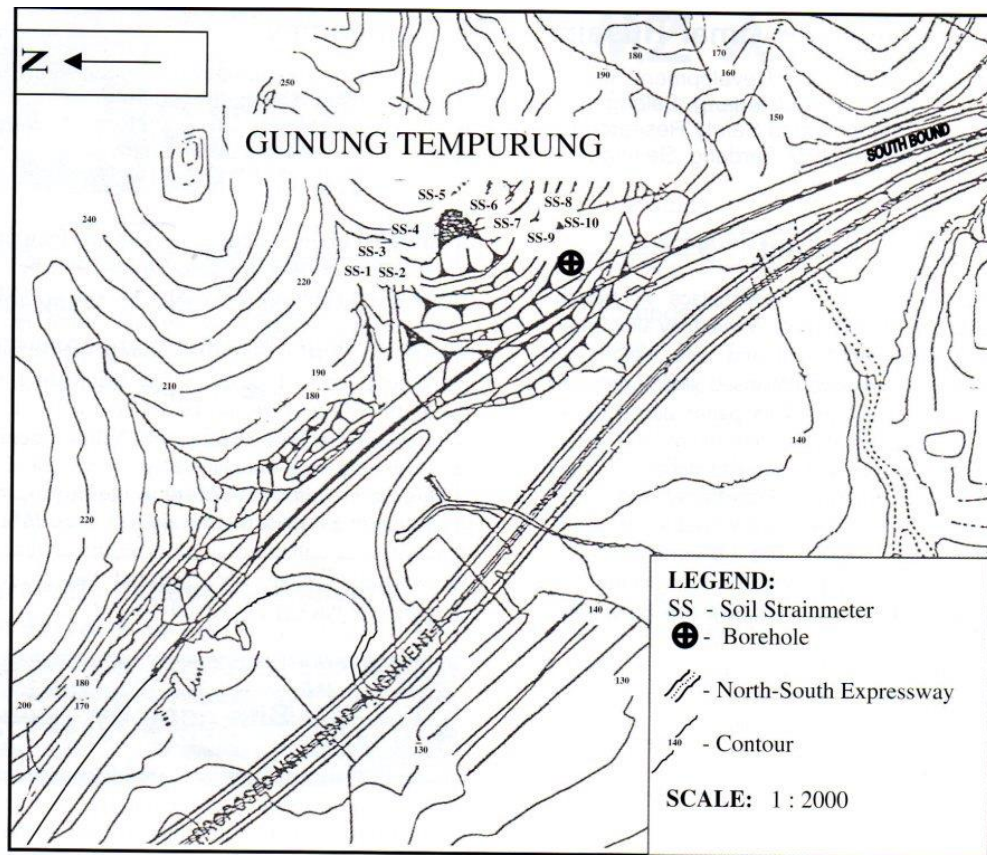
Site plan showing slope failure and location of soil strainmeters (Husaini & Ratnasamy 2001)
